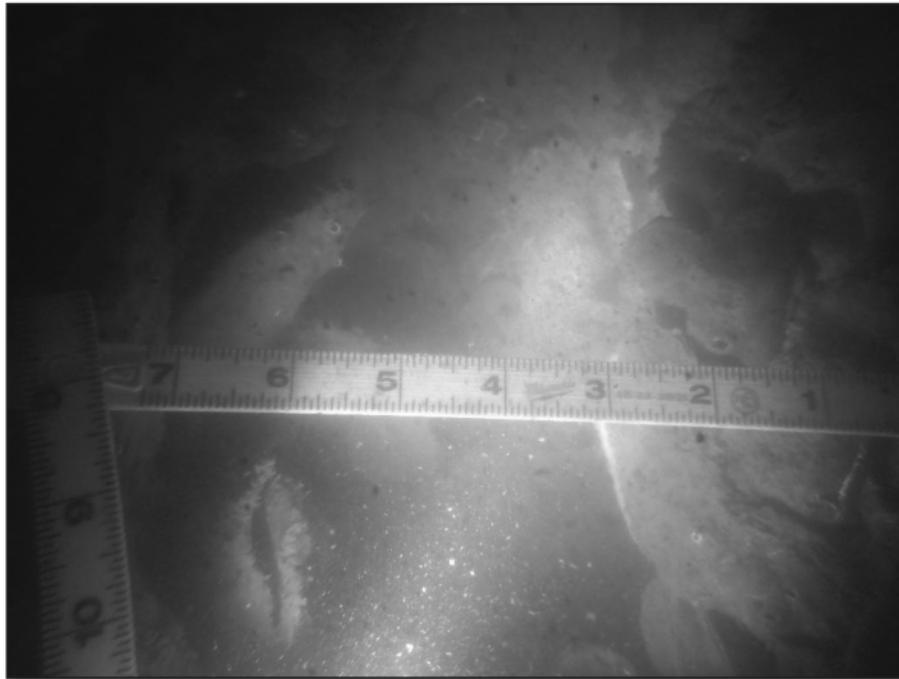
10”W x 6’H Gap in Sheets with Fill Visible at 27+30 (Apparent Construction Defect)
